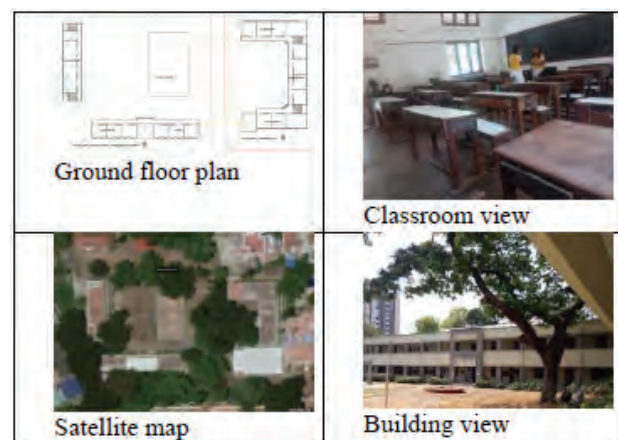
Modern Building– Plan, View, Satellite Map and Building View
